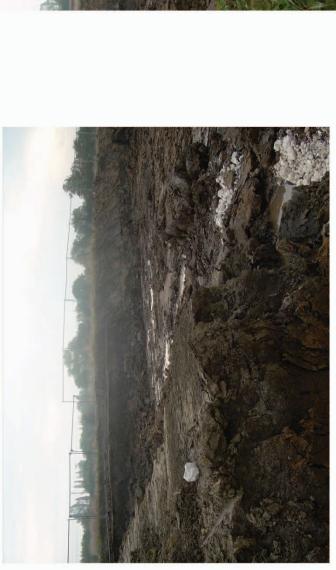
View of the Excavation of the Large Tank Pit. Facing South. Plate 28. View of the Excavation of the Large Tank Pit. Facing South.
